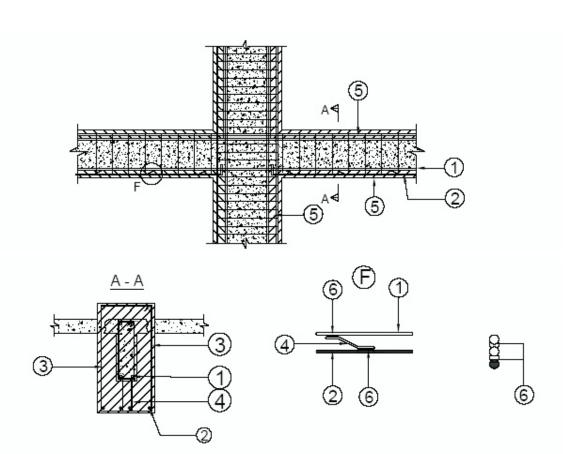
Strengthening of concrete beams by one-sided jacketing (1. Existing reinforcement; 2. Added longitudinal reinforcement; 3. Added stirrups; 4. Welded connecting bar; 5. Concrete jacket. 6. Welding;)
